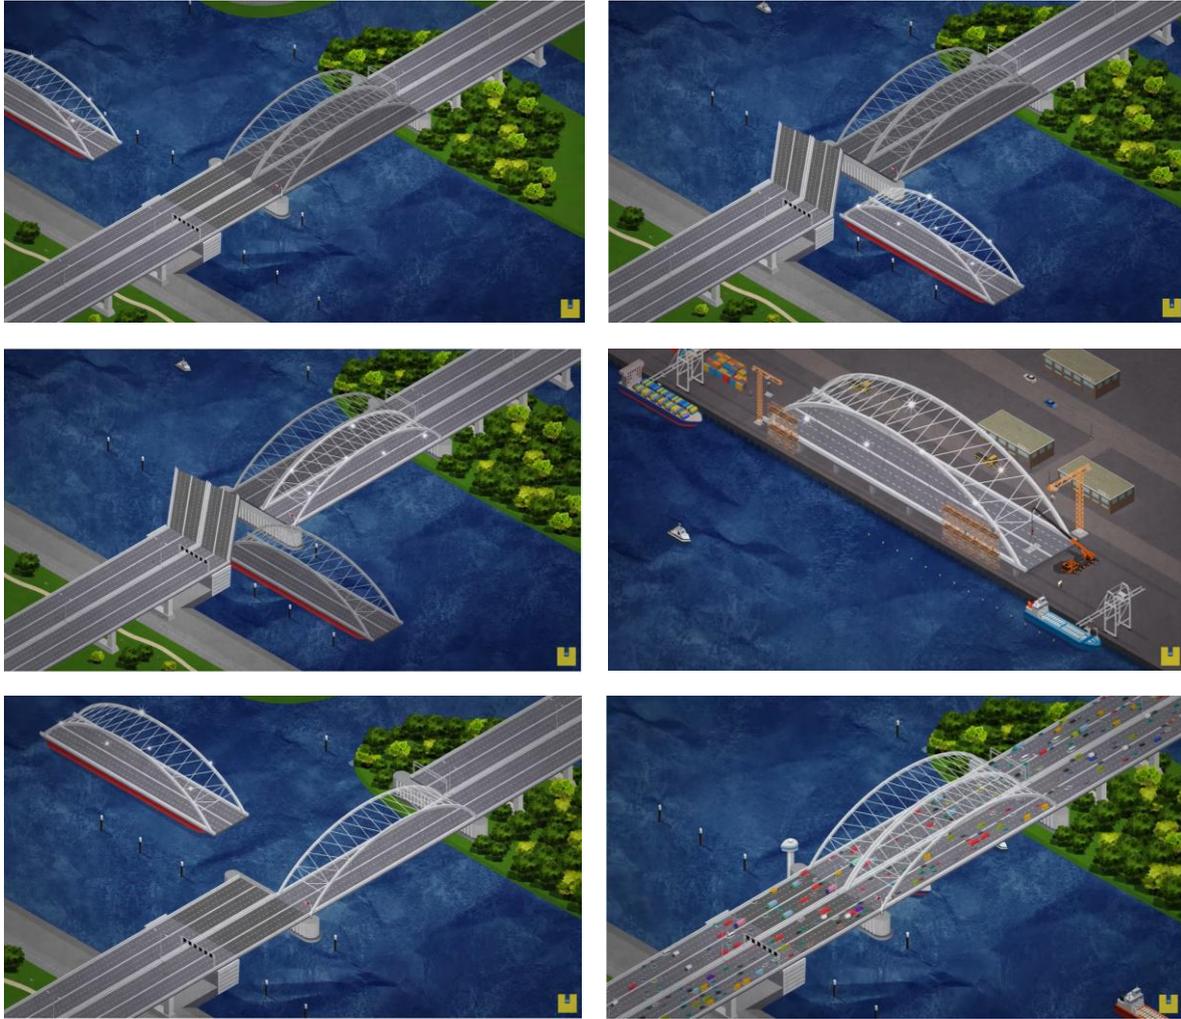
Schematic overview of the renovation of the Van Brienoord bridge [51].
